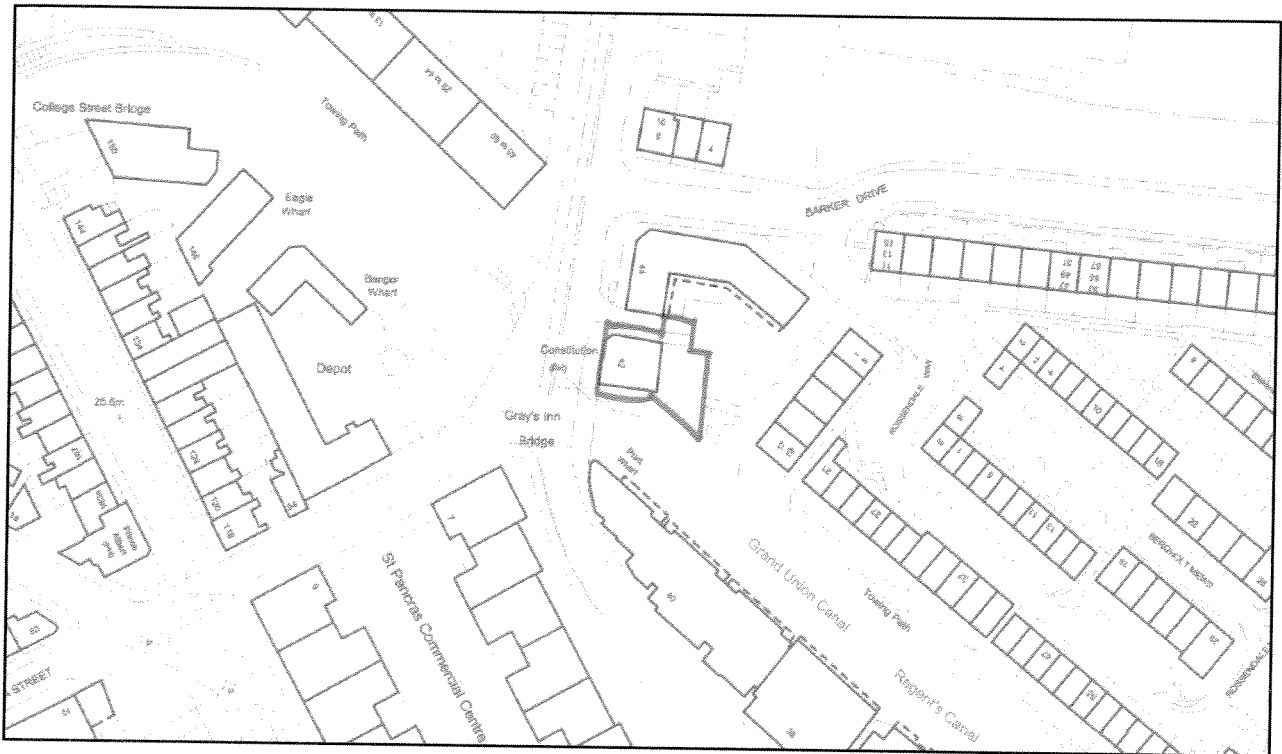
Site Location Plan (not to scale) – the site is edged in red
